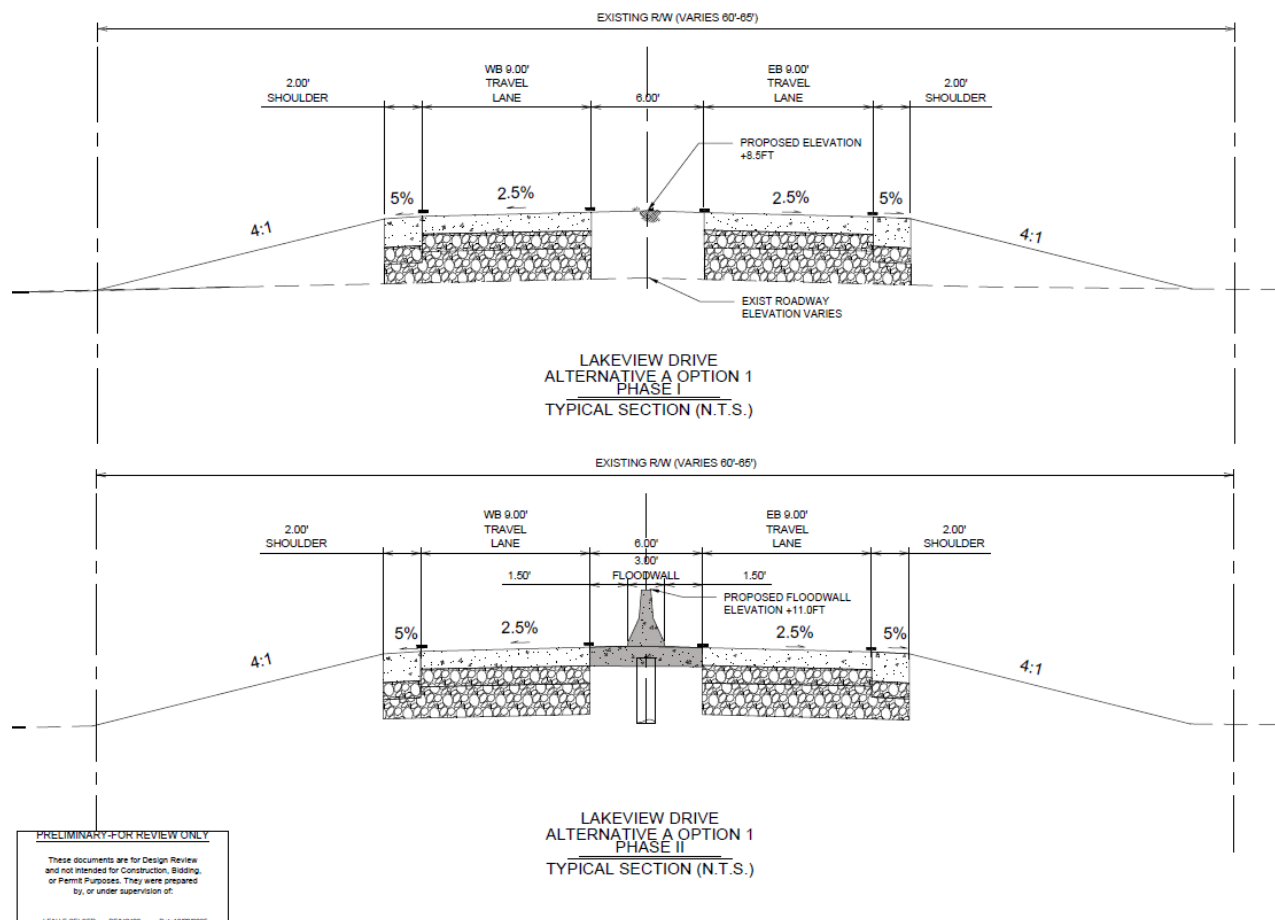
Alternative A, Option 1 - +8.5 ft Embankment, +11.0 ft Sheetpile Foundation Floodwall
